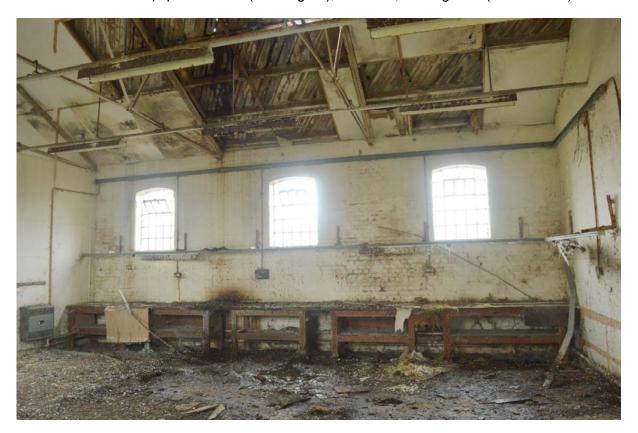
Equipment store (Building 28), first floor, looking south (SGA15-197)
